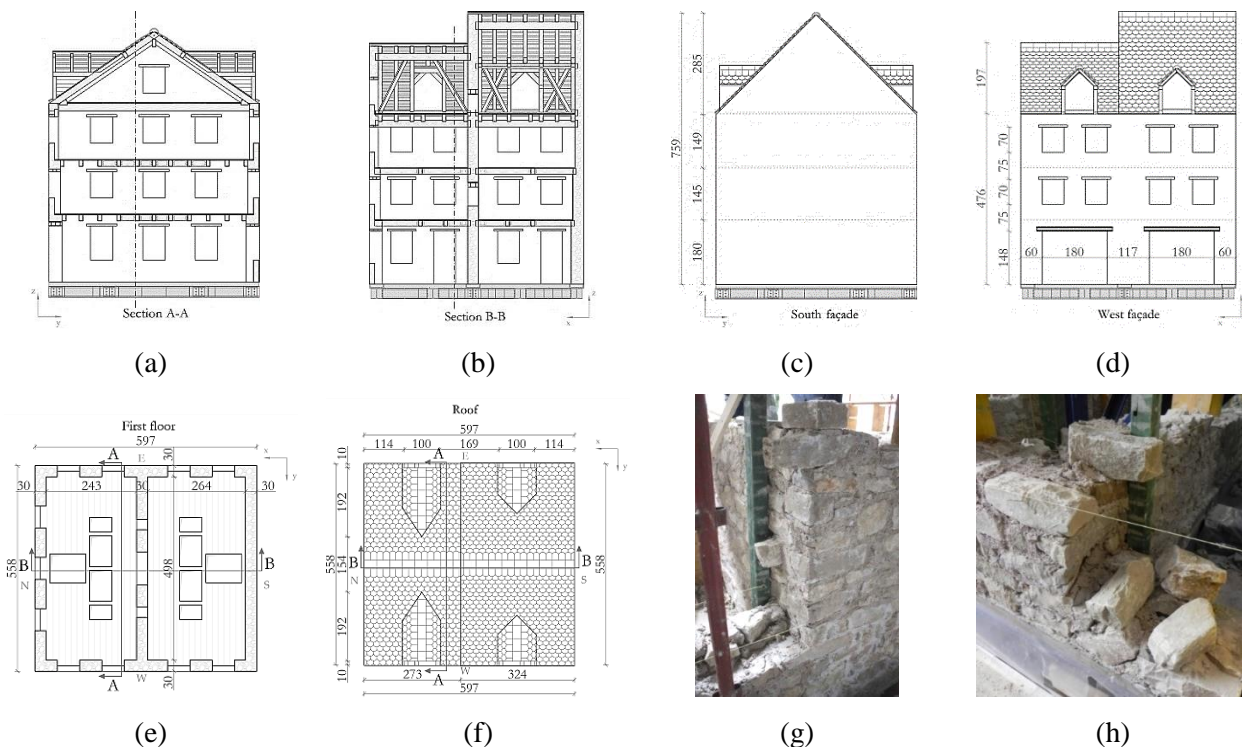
Building aggregate prototype: (a) section looking North; (b) section looking East; (c) South façade; (d) West façade; (e) first-floor plan; (f) roof plan; (g, h) structural joint connection detail.
